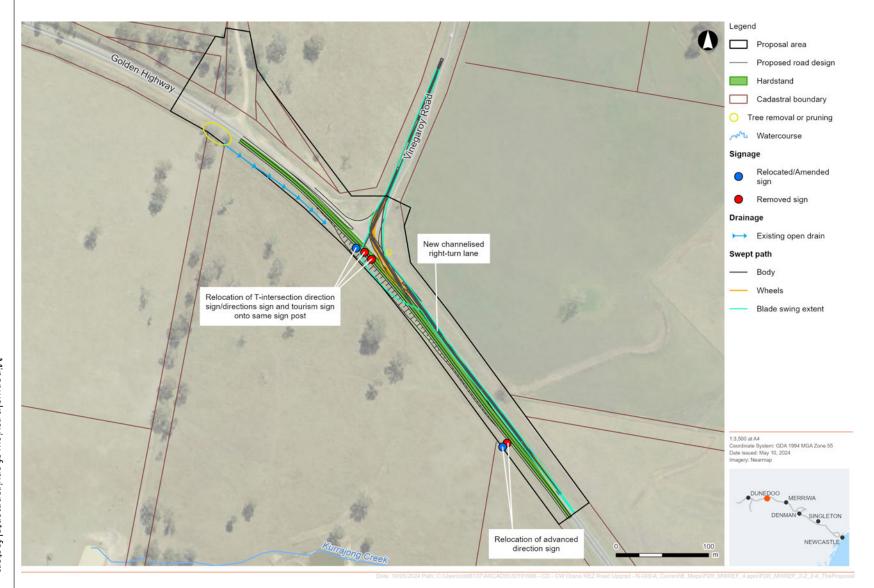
The proposal – Golden Highway and Vinegaroy Road intersection, Cassilis (I-010)
